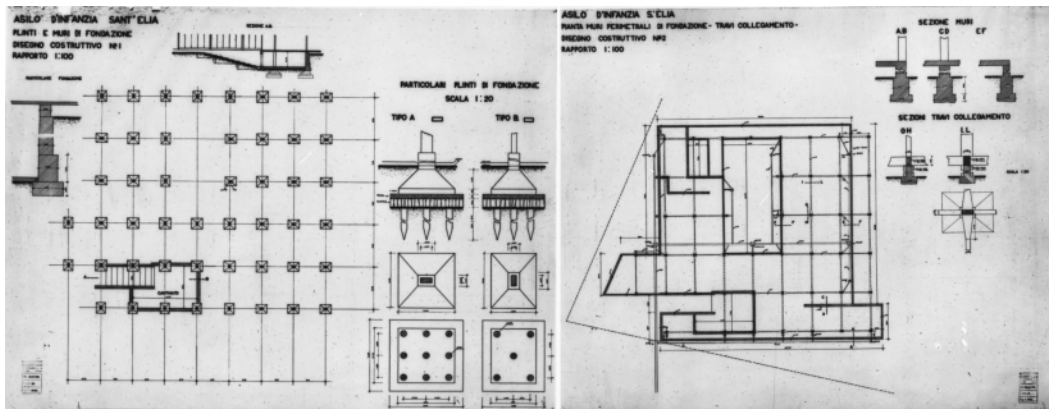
Executive design, foundation plinths and walls (AT, construction drawing n°.1, 14 July 1936, 40/002/E1/D/L); Ground plan of perimeter foundation walls and tie beams (AT, construction drawing n°.2, 23 July 1936, 40/001/E1/D/L).
